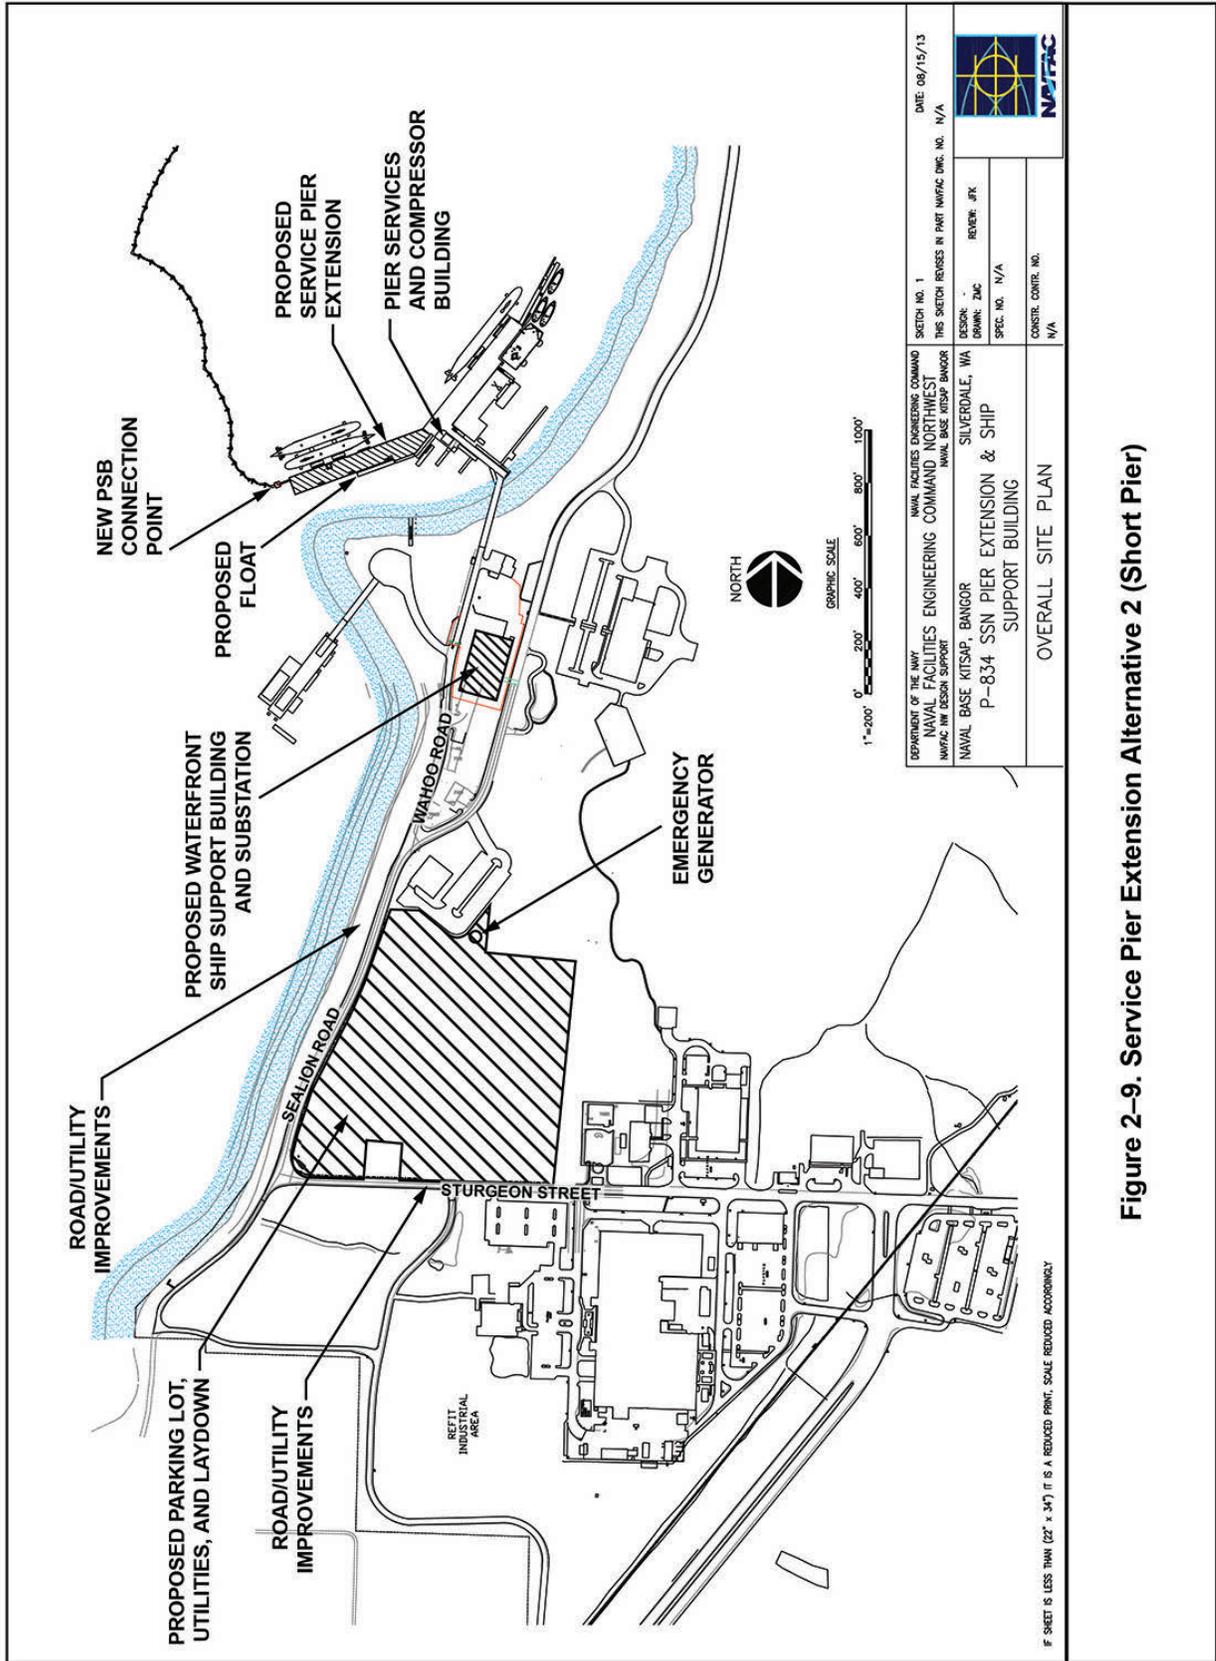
Service Pier Extension Alternative 2 (Short Pier)
